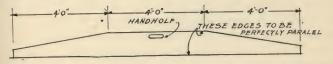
Detail of straightedge. Material—11/4 in. × 6 in. white pine.
